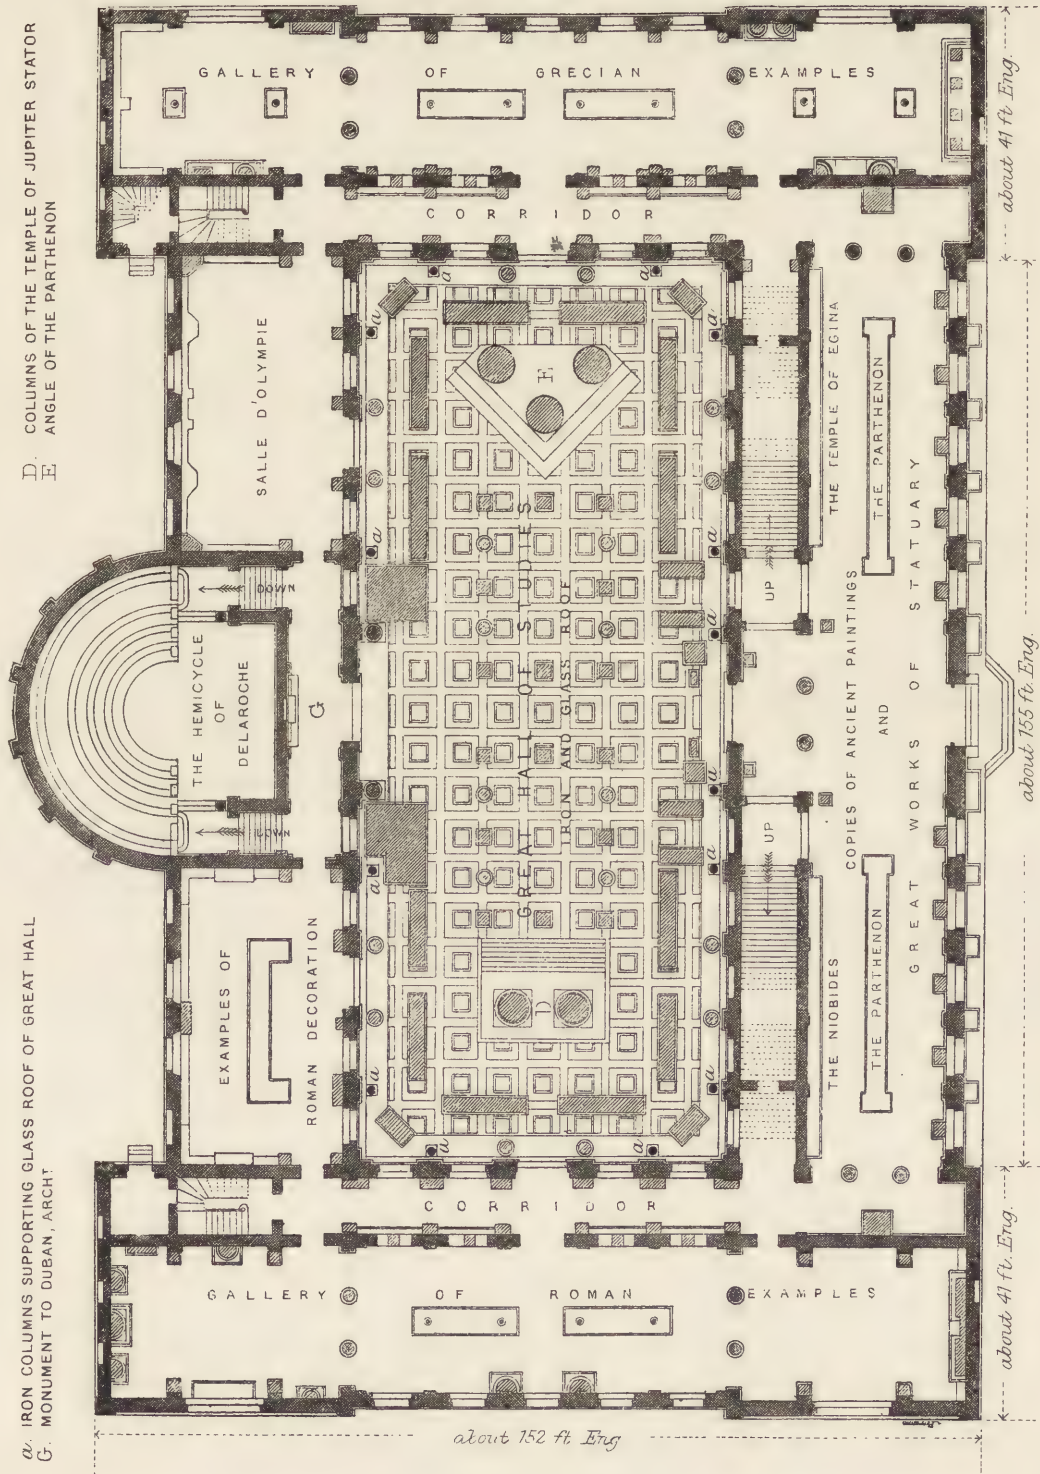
FIG. III. GROUND PLAN OF BUILDINGS AAAAA IN THE ÉCOLE DES BEAUX-ARTS.
